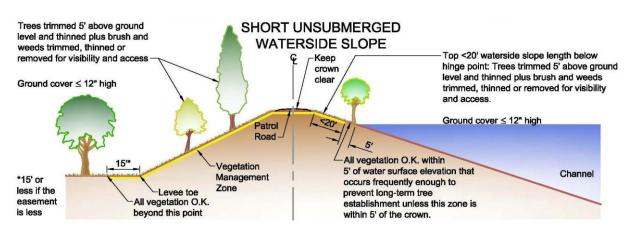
Vegetation Management for Existing Levees – Short Waterside Slope and a Short Waterside Slope above the Water Surface Elevation that Frequently Submerges the Lower Waterside Slope
